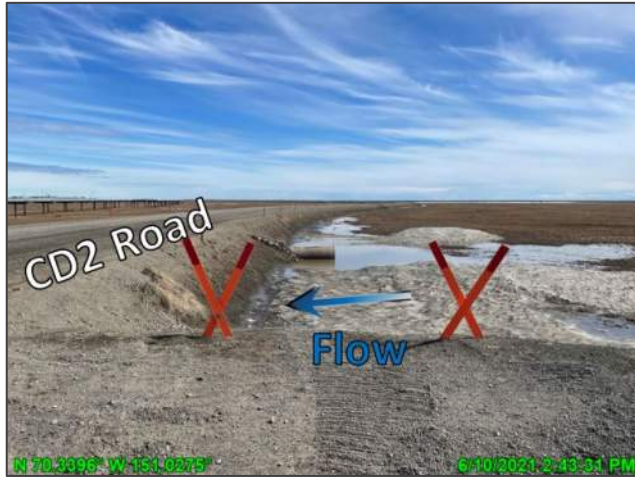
CD2 road embankment in the vicinity of culvert CD2-8, looking east; June 10, 2021
